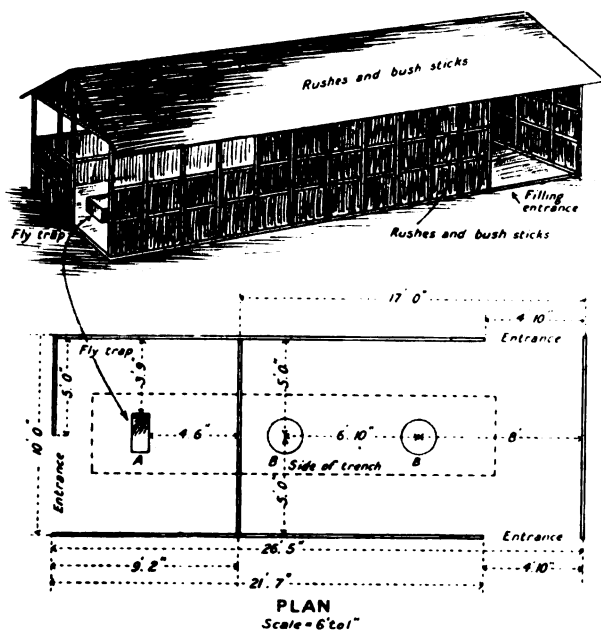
Sketch and plan of "fly-trapped pit" with two filling orifices.
